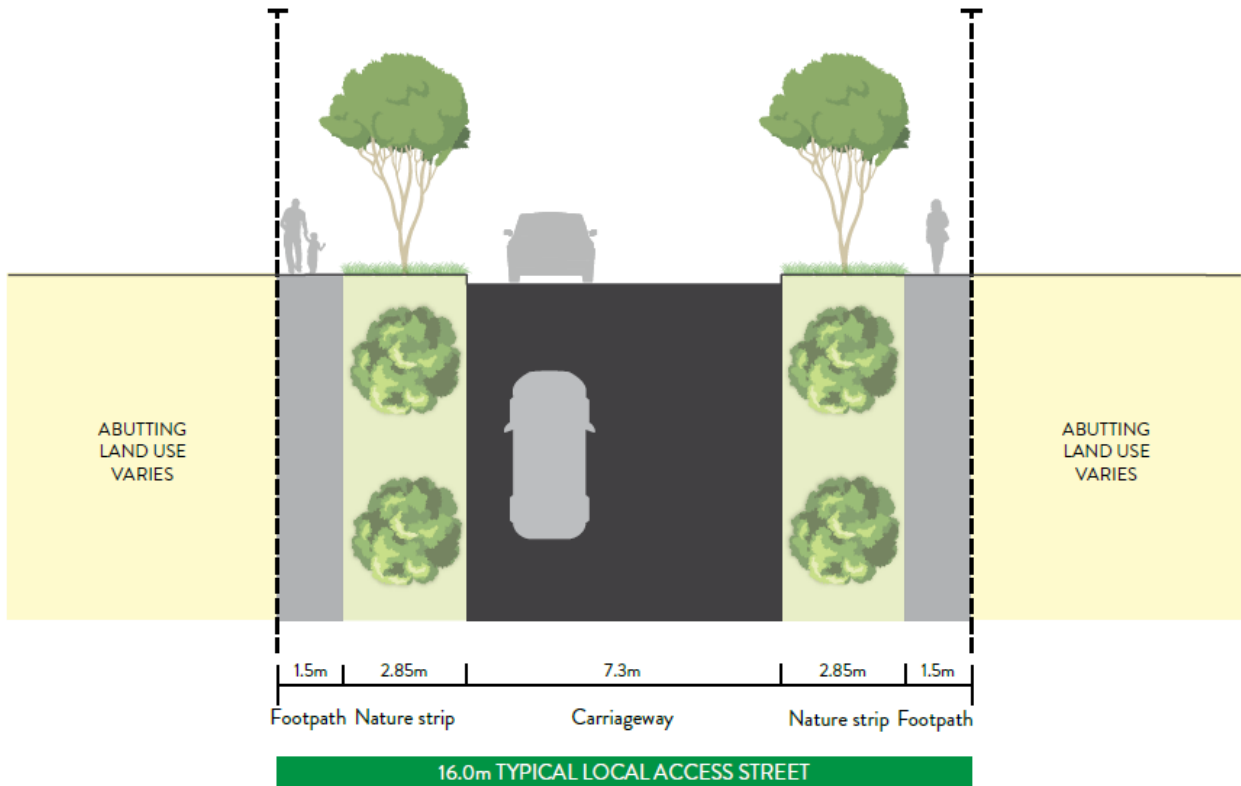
Cross Section J - 16m Key Local Access Street (Level 1) (Draft Marshall PSP)
